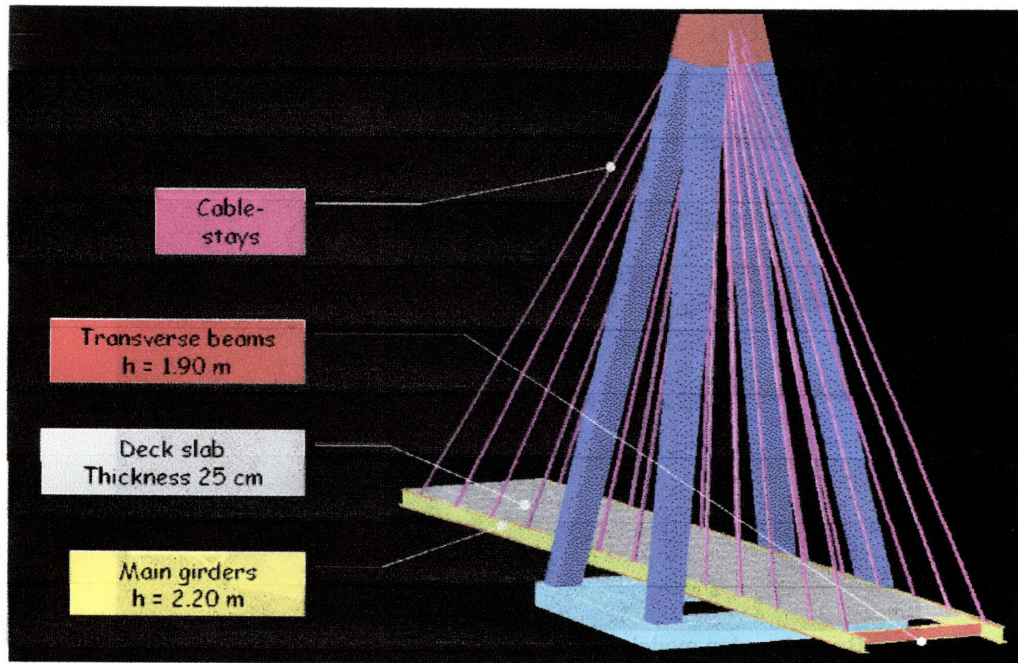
Rion-Antirion Bridge's deck and cables model
